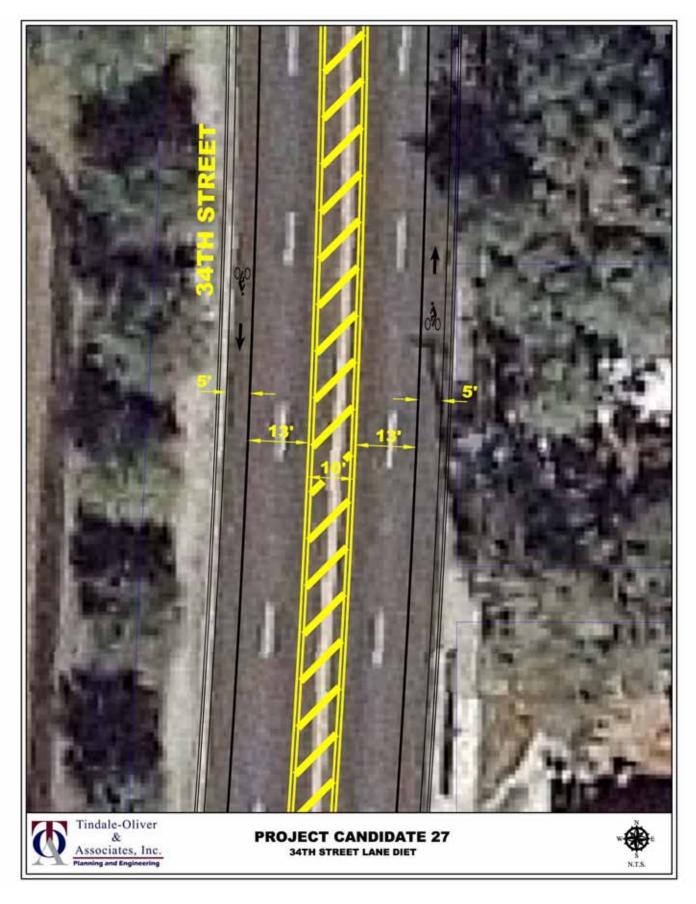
34th Street Lane Diet – Dr. MLK Jr. Blvd to Lake Avenue
